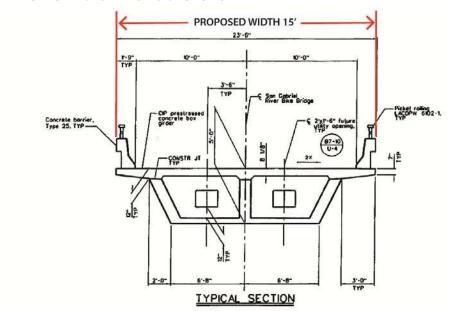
Proposed change to the section detail from the DWP's construction documents.
